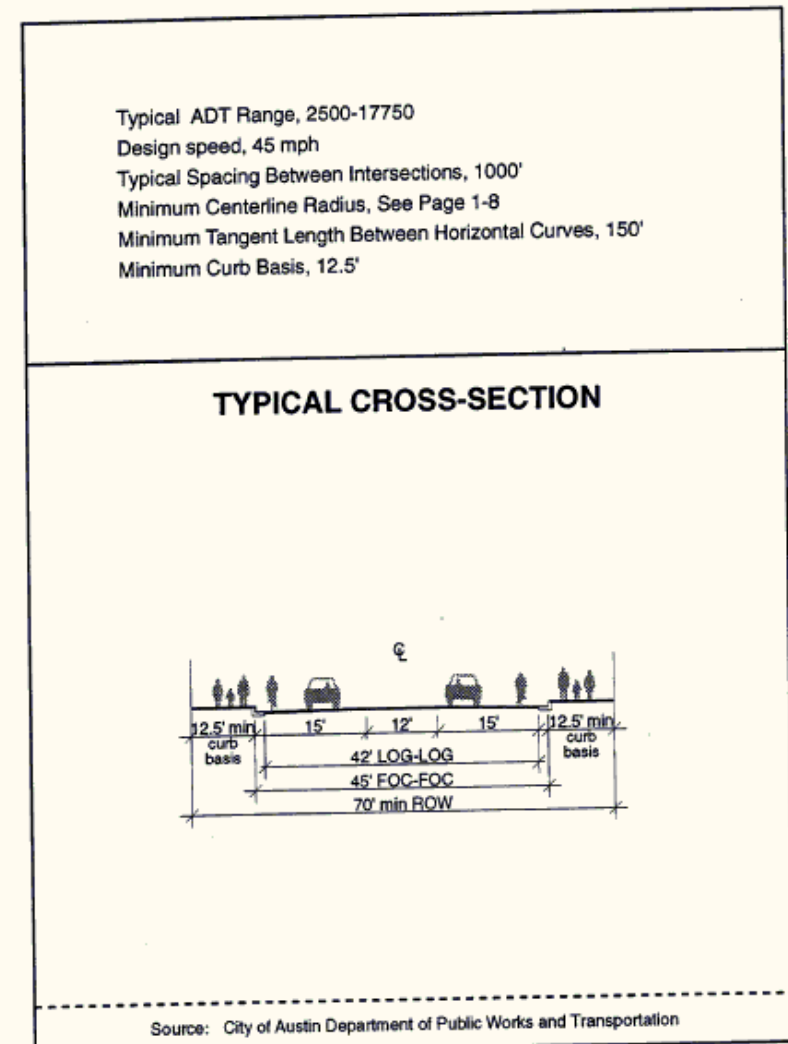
37A Cross section for 2 lane Minor Arterial Roadway
